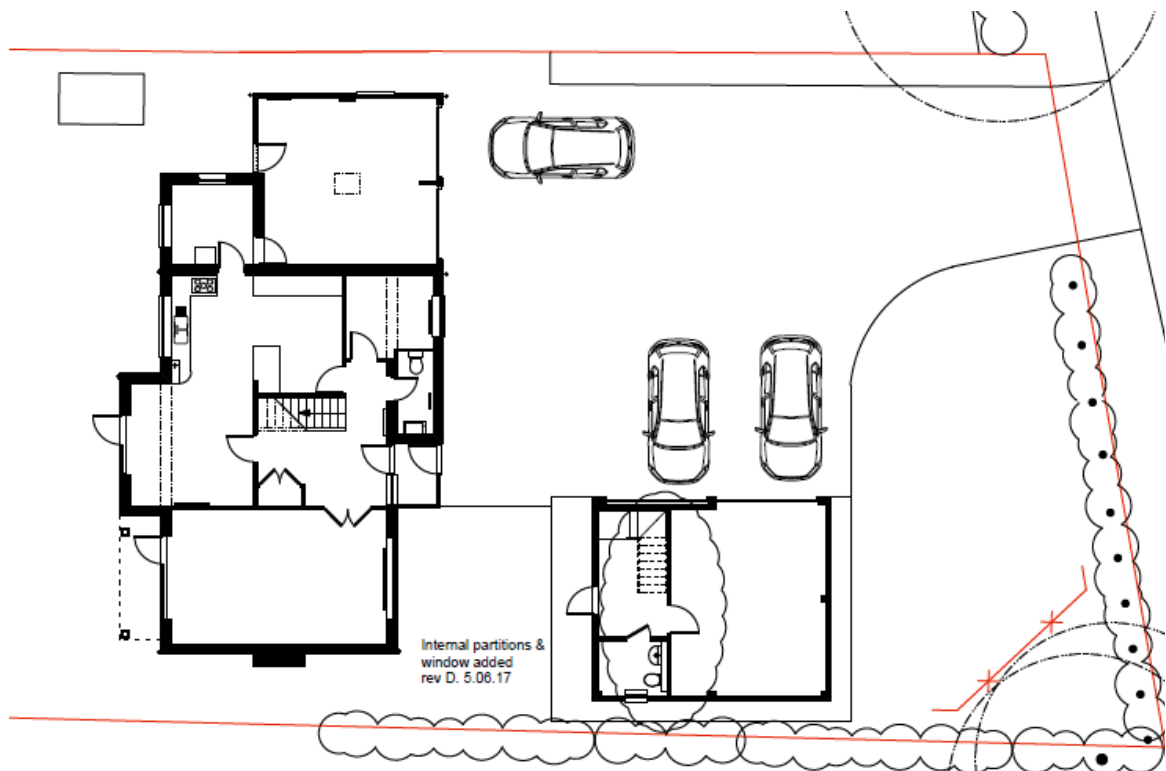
Latest approved site plan for garage building (17/01646/HOUSE)
